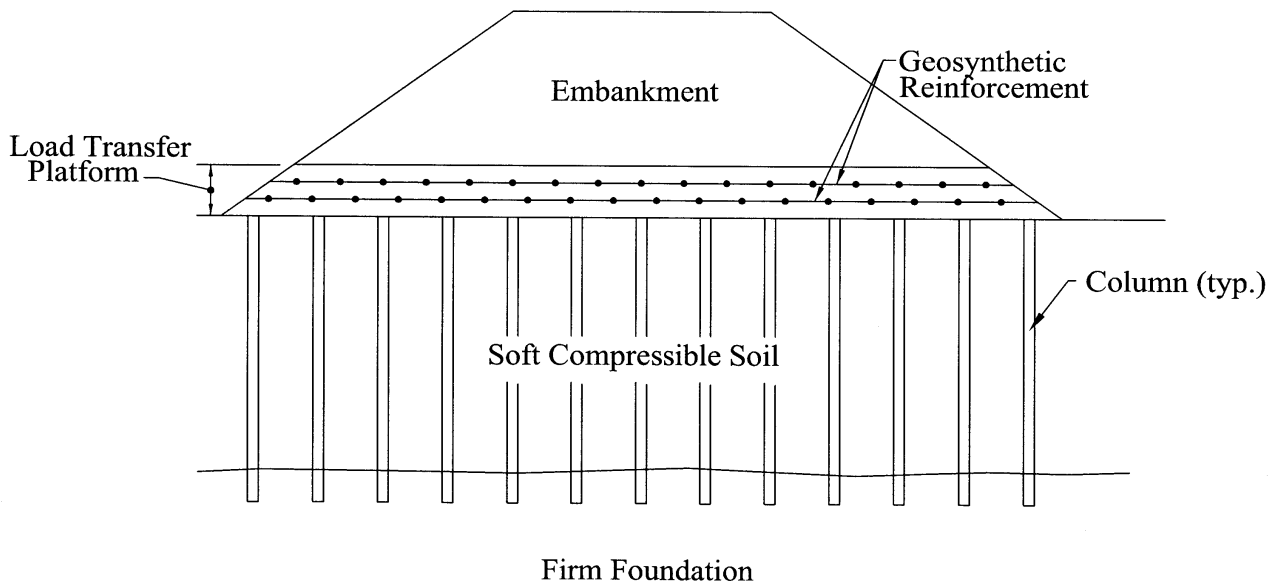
Column Supported Embankment with Geosynthetic Reinforcement.⁽¹⁾
